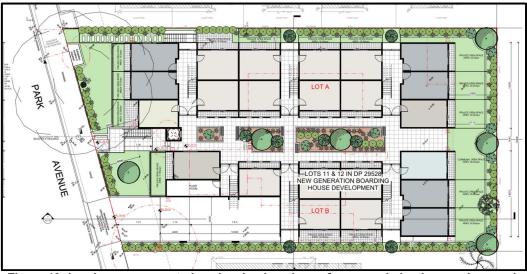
Landscape concept plan showing locations of proposed plantings and general planting scheme. Refer also to detailed landscape plans
